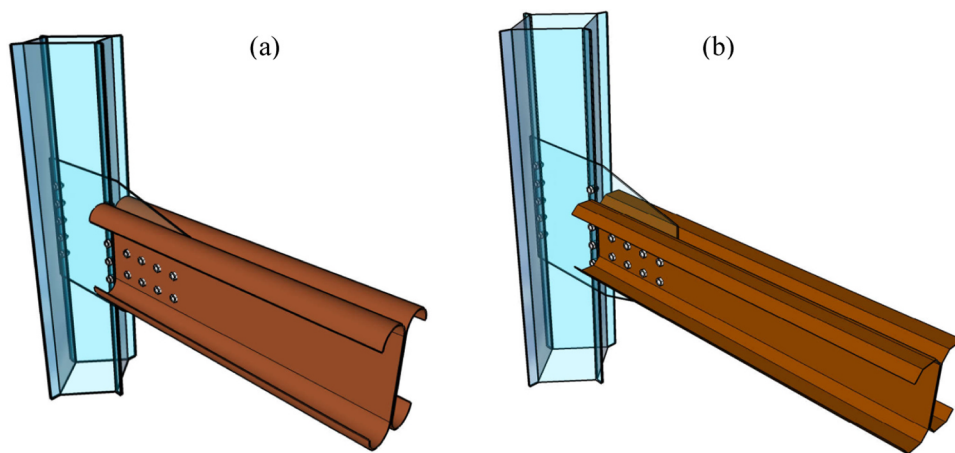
Configuration of CFS moment resisting connections using gusset plate with (a) curved flange beam adopted from [22] and (b) folded flange beam adopted from [23].
